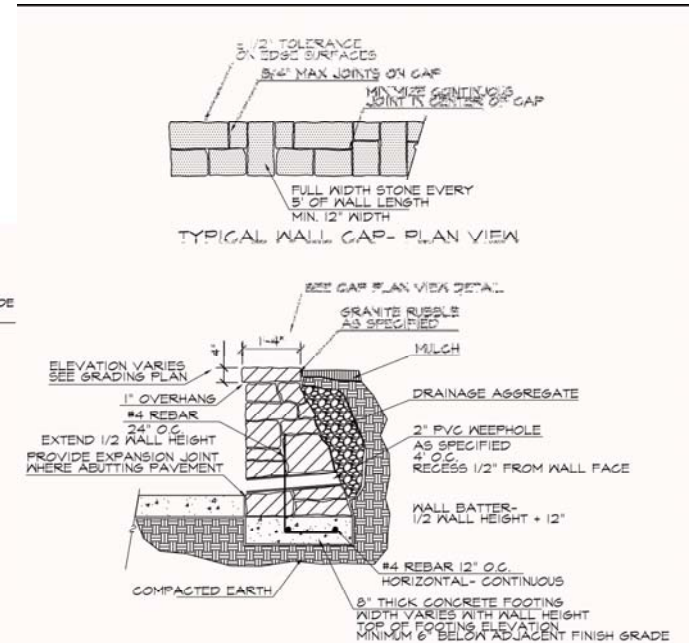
Section of Granite Retaining Wall (gravity type). W = Not less than 16 inches, H = Not more than 60 inches.
